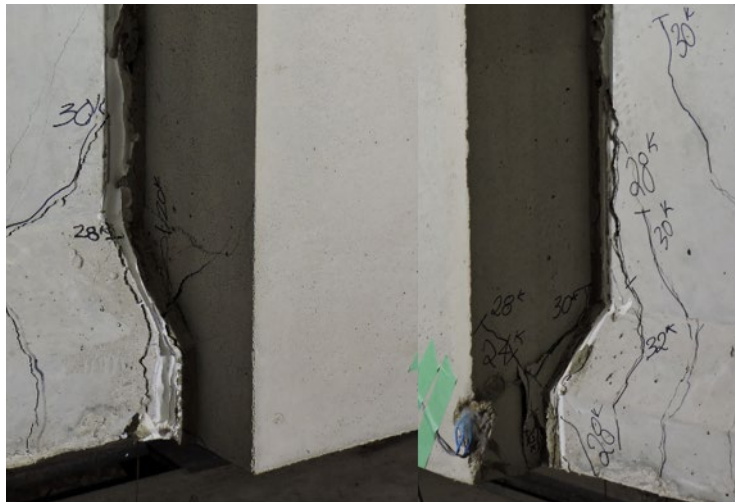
Specimen R1-FRSCC girder-joint interface cracking on the front left (left) and front right (right)
